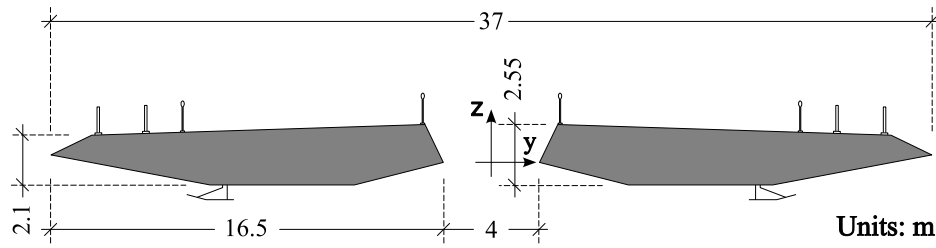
Sketch of the Halsafjorden Bridge twin-deck cross-section.
